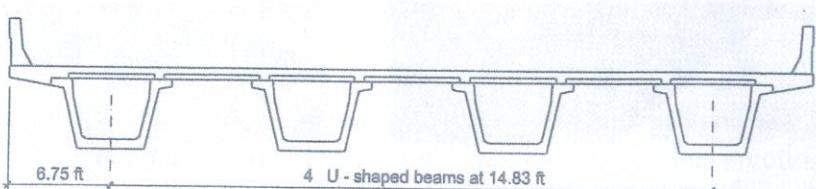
Precast U-shaped bridge units with cast in-situ deck slab
